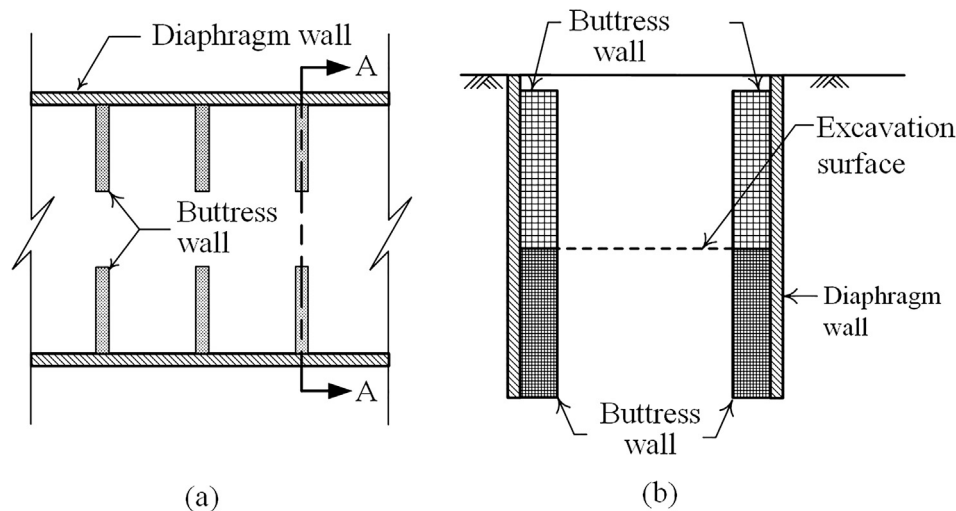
Schematic diagram of buttress walls: (a) plan (b) A-A Section.
